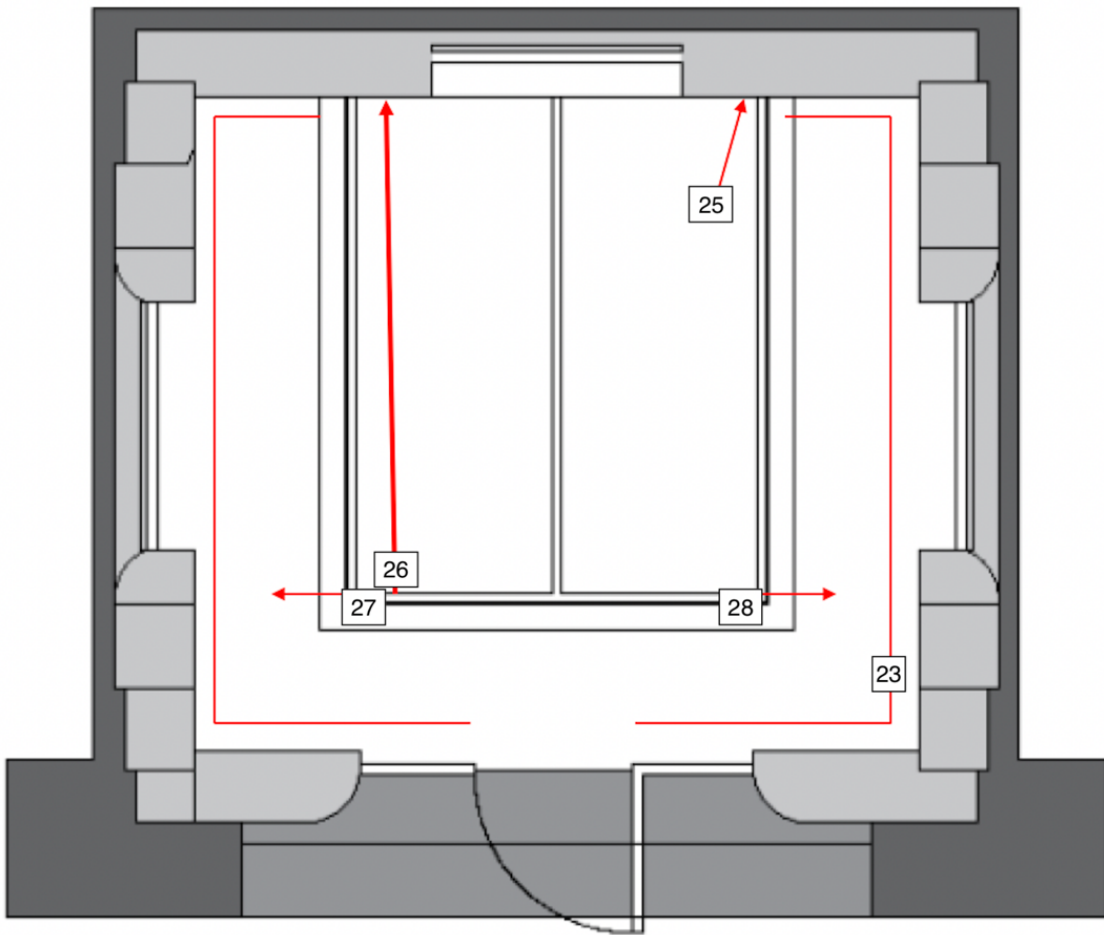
Floor plan with major interior cracks annotated in red. Locations of Figures 23 and 25-28 labelled.
